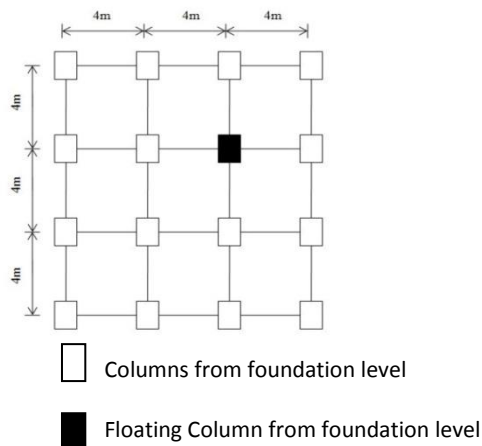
Plan showing the considered RC frame building with floating column FRAME WITH FLOATING COLUMNS -III (FWFC - III)
